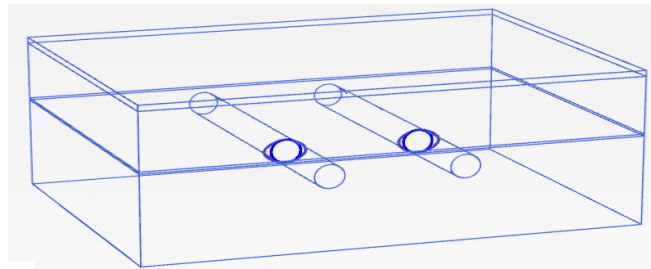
lateral deformation of tunnel at spacing between two tunnels 4.5D with lining thickness of tunnel=0.085D.
